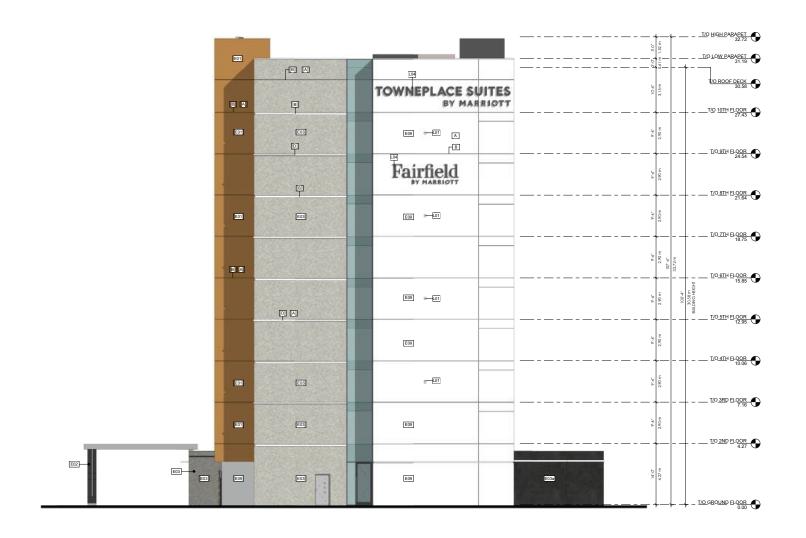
East Elevation (Prepared by Mataj Architects Inc.)
